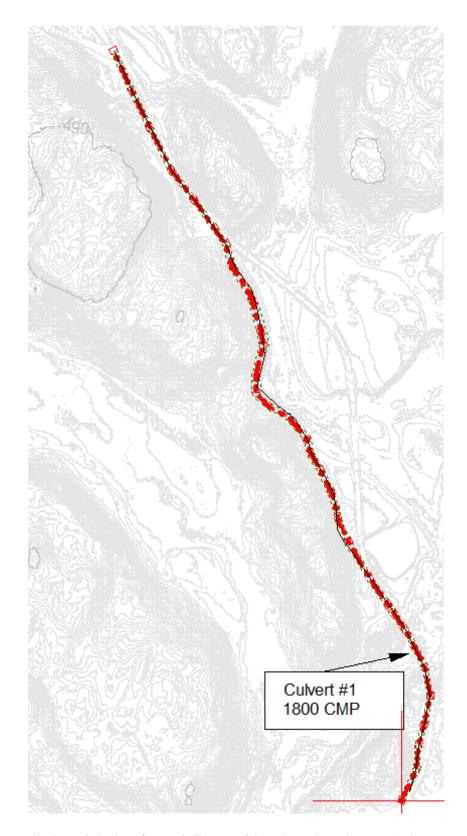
Blind road design for mainline 1 with culvert locations and sizes.
